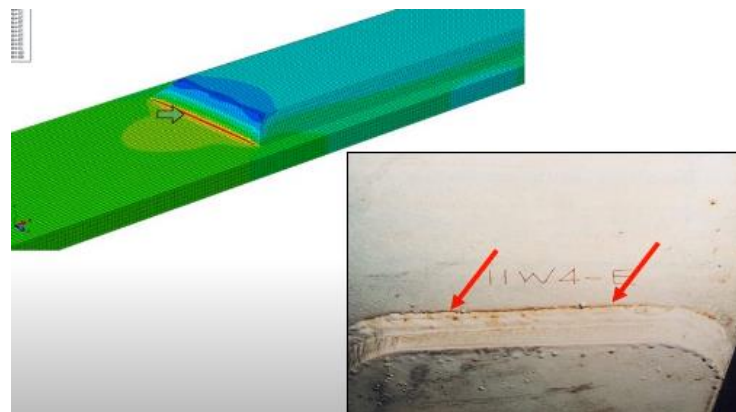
Stress Concentration at bridge detail (flange and cover plate connection)
